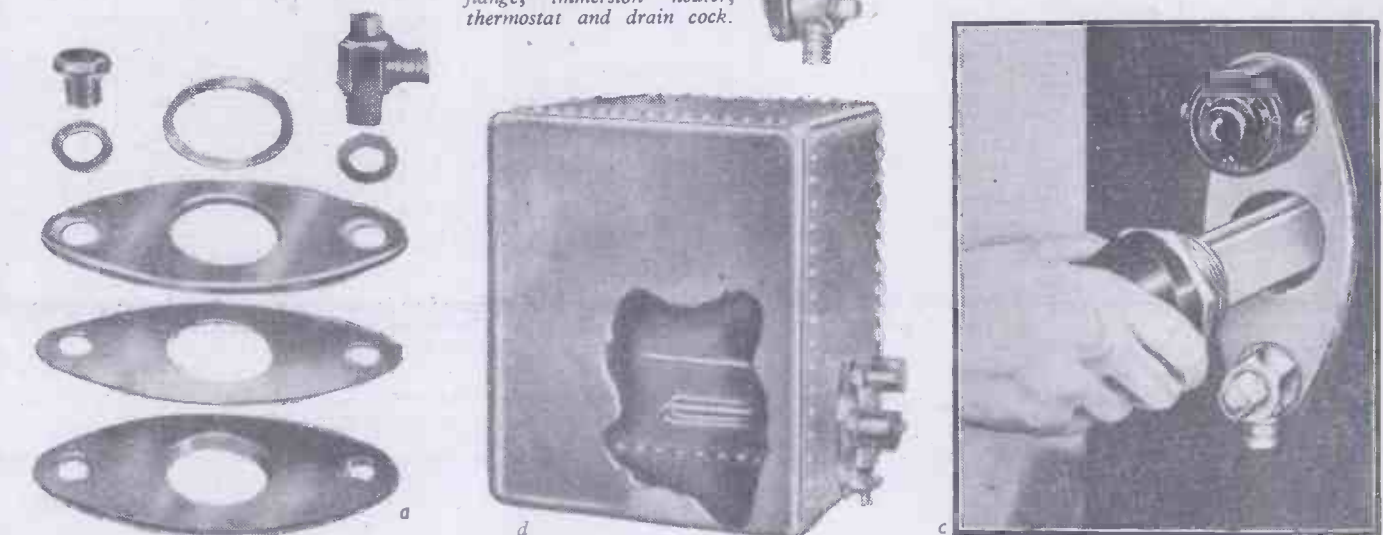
Special three-way flange. (a) "Exploded" view, complete, with drain cock. An elliptical hole must be cut in the tank (template is supplied by the makers). (c) Screwing the immersion heater into the flange. (d) This type fitted to a tank.
